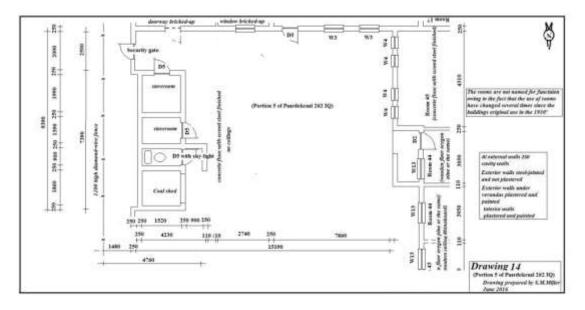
Above. Layout of coal shed and storerooms. (Drawing S.M. Miller 2016.)
